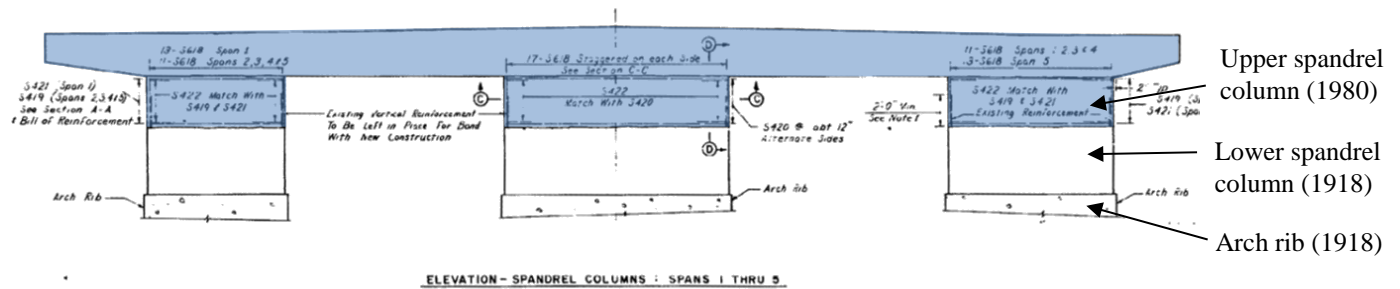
Typical bridge cross section from 1980 plans. Blue shading indicates cap beams and upper portions of spandrel columns that were replaced in 1980.
